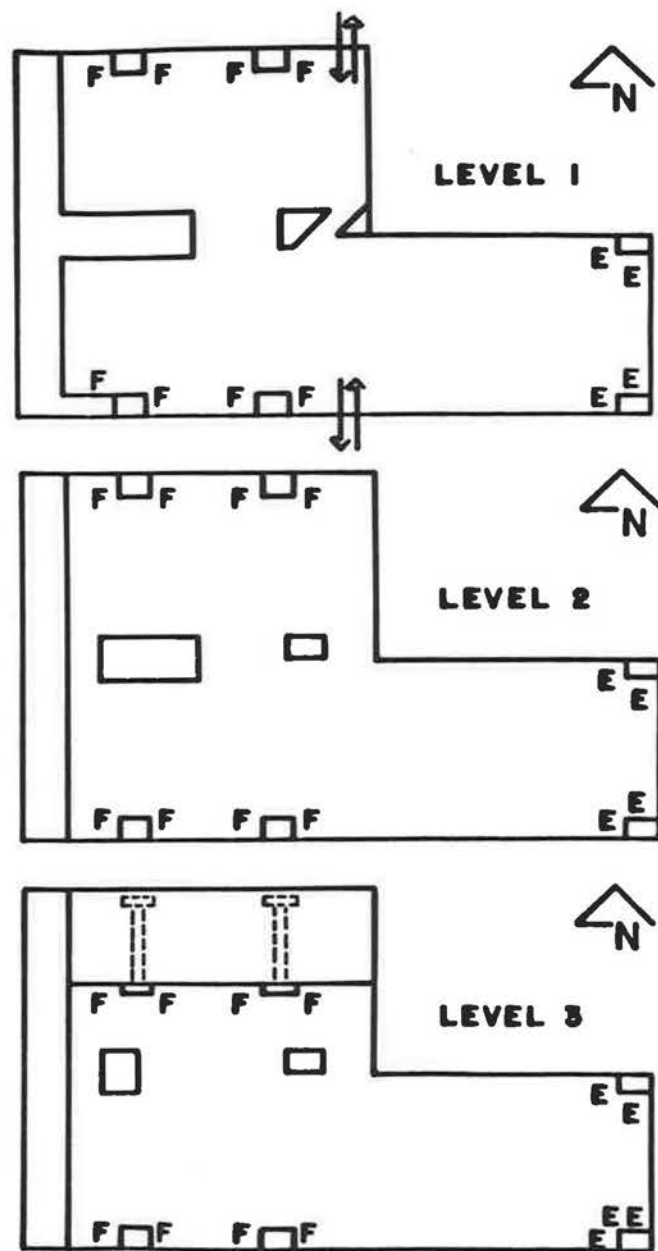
Original configuration of fans in the parking garage; F denotes fresh air supply fans, E denotes exhaust fans
